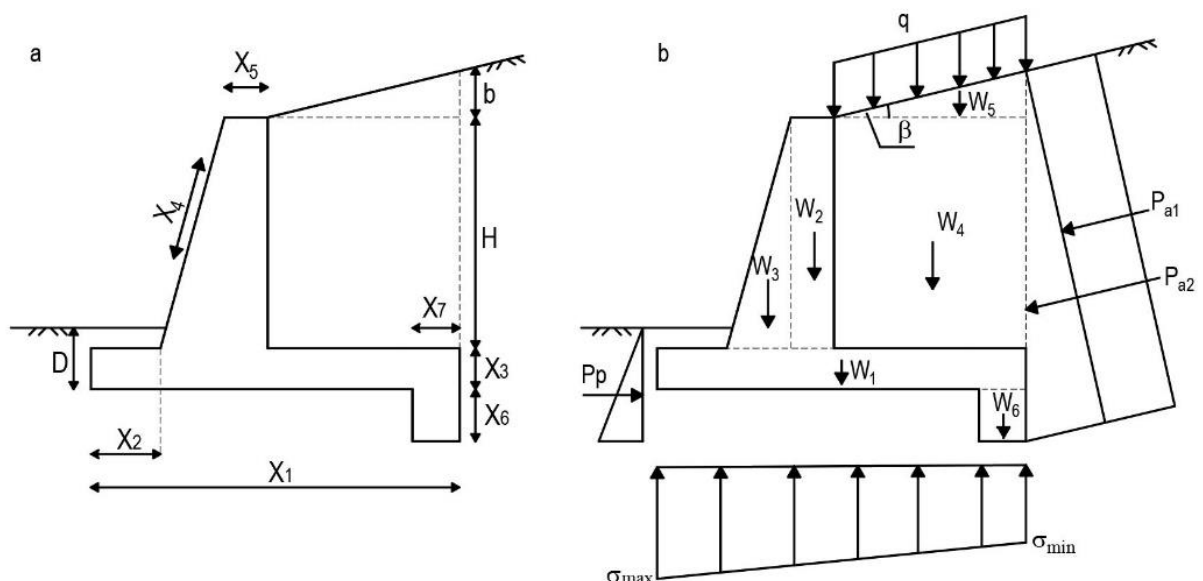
Concrete cantilever retaining wall design with key: (a) wall dimensions; (b) acting loads to the wall.
